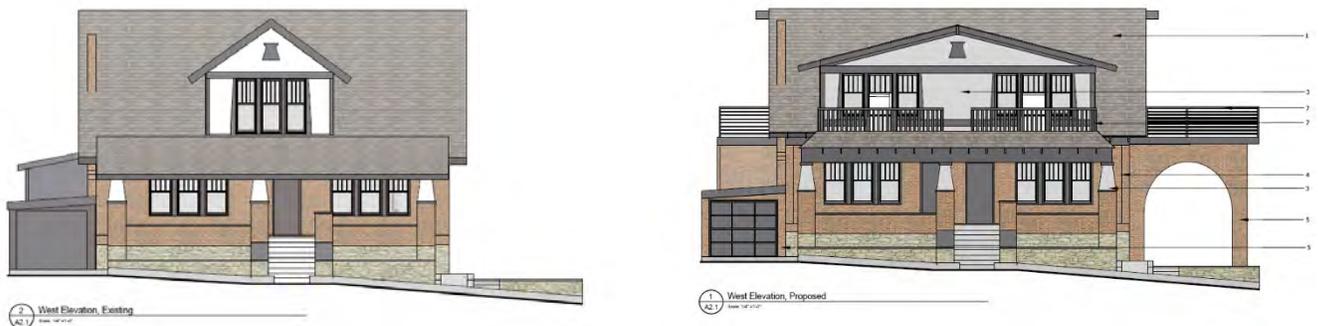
Existing & Proposed West Elevation (façade). Not to scale.
